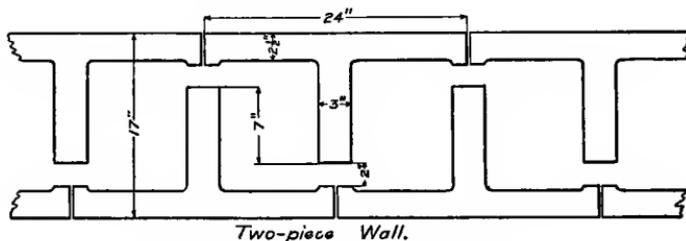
TOP VIEW OF TWO-PIECE WALL.
